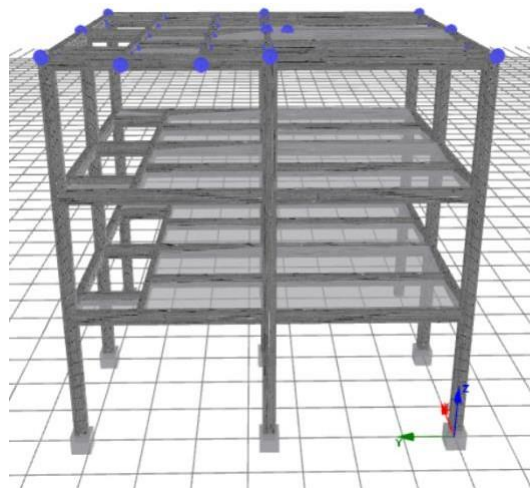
3D modeling of shophouse building structure without walls (model 1) using Seismostruct Software (Side View)
